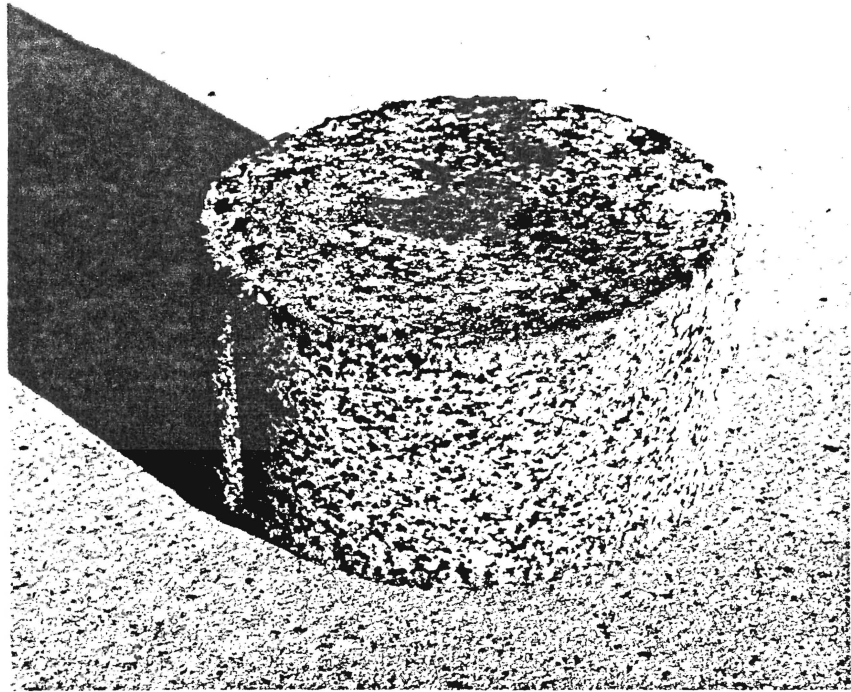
Marshall Specimen made with Sand and Foamed Asphalt
